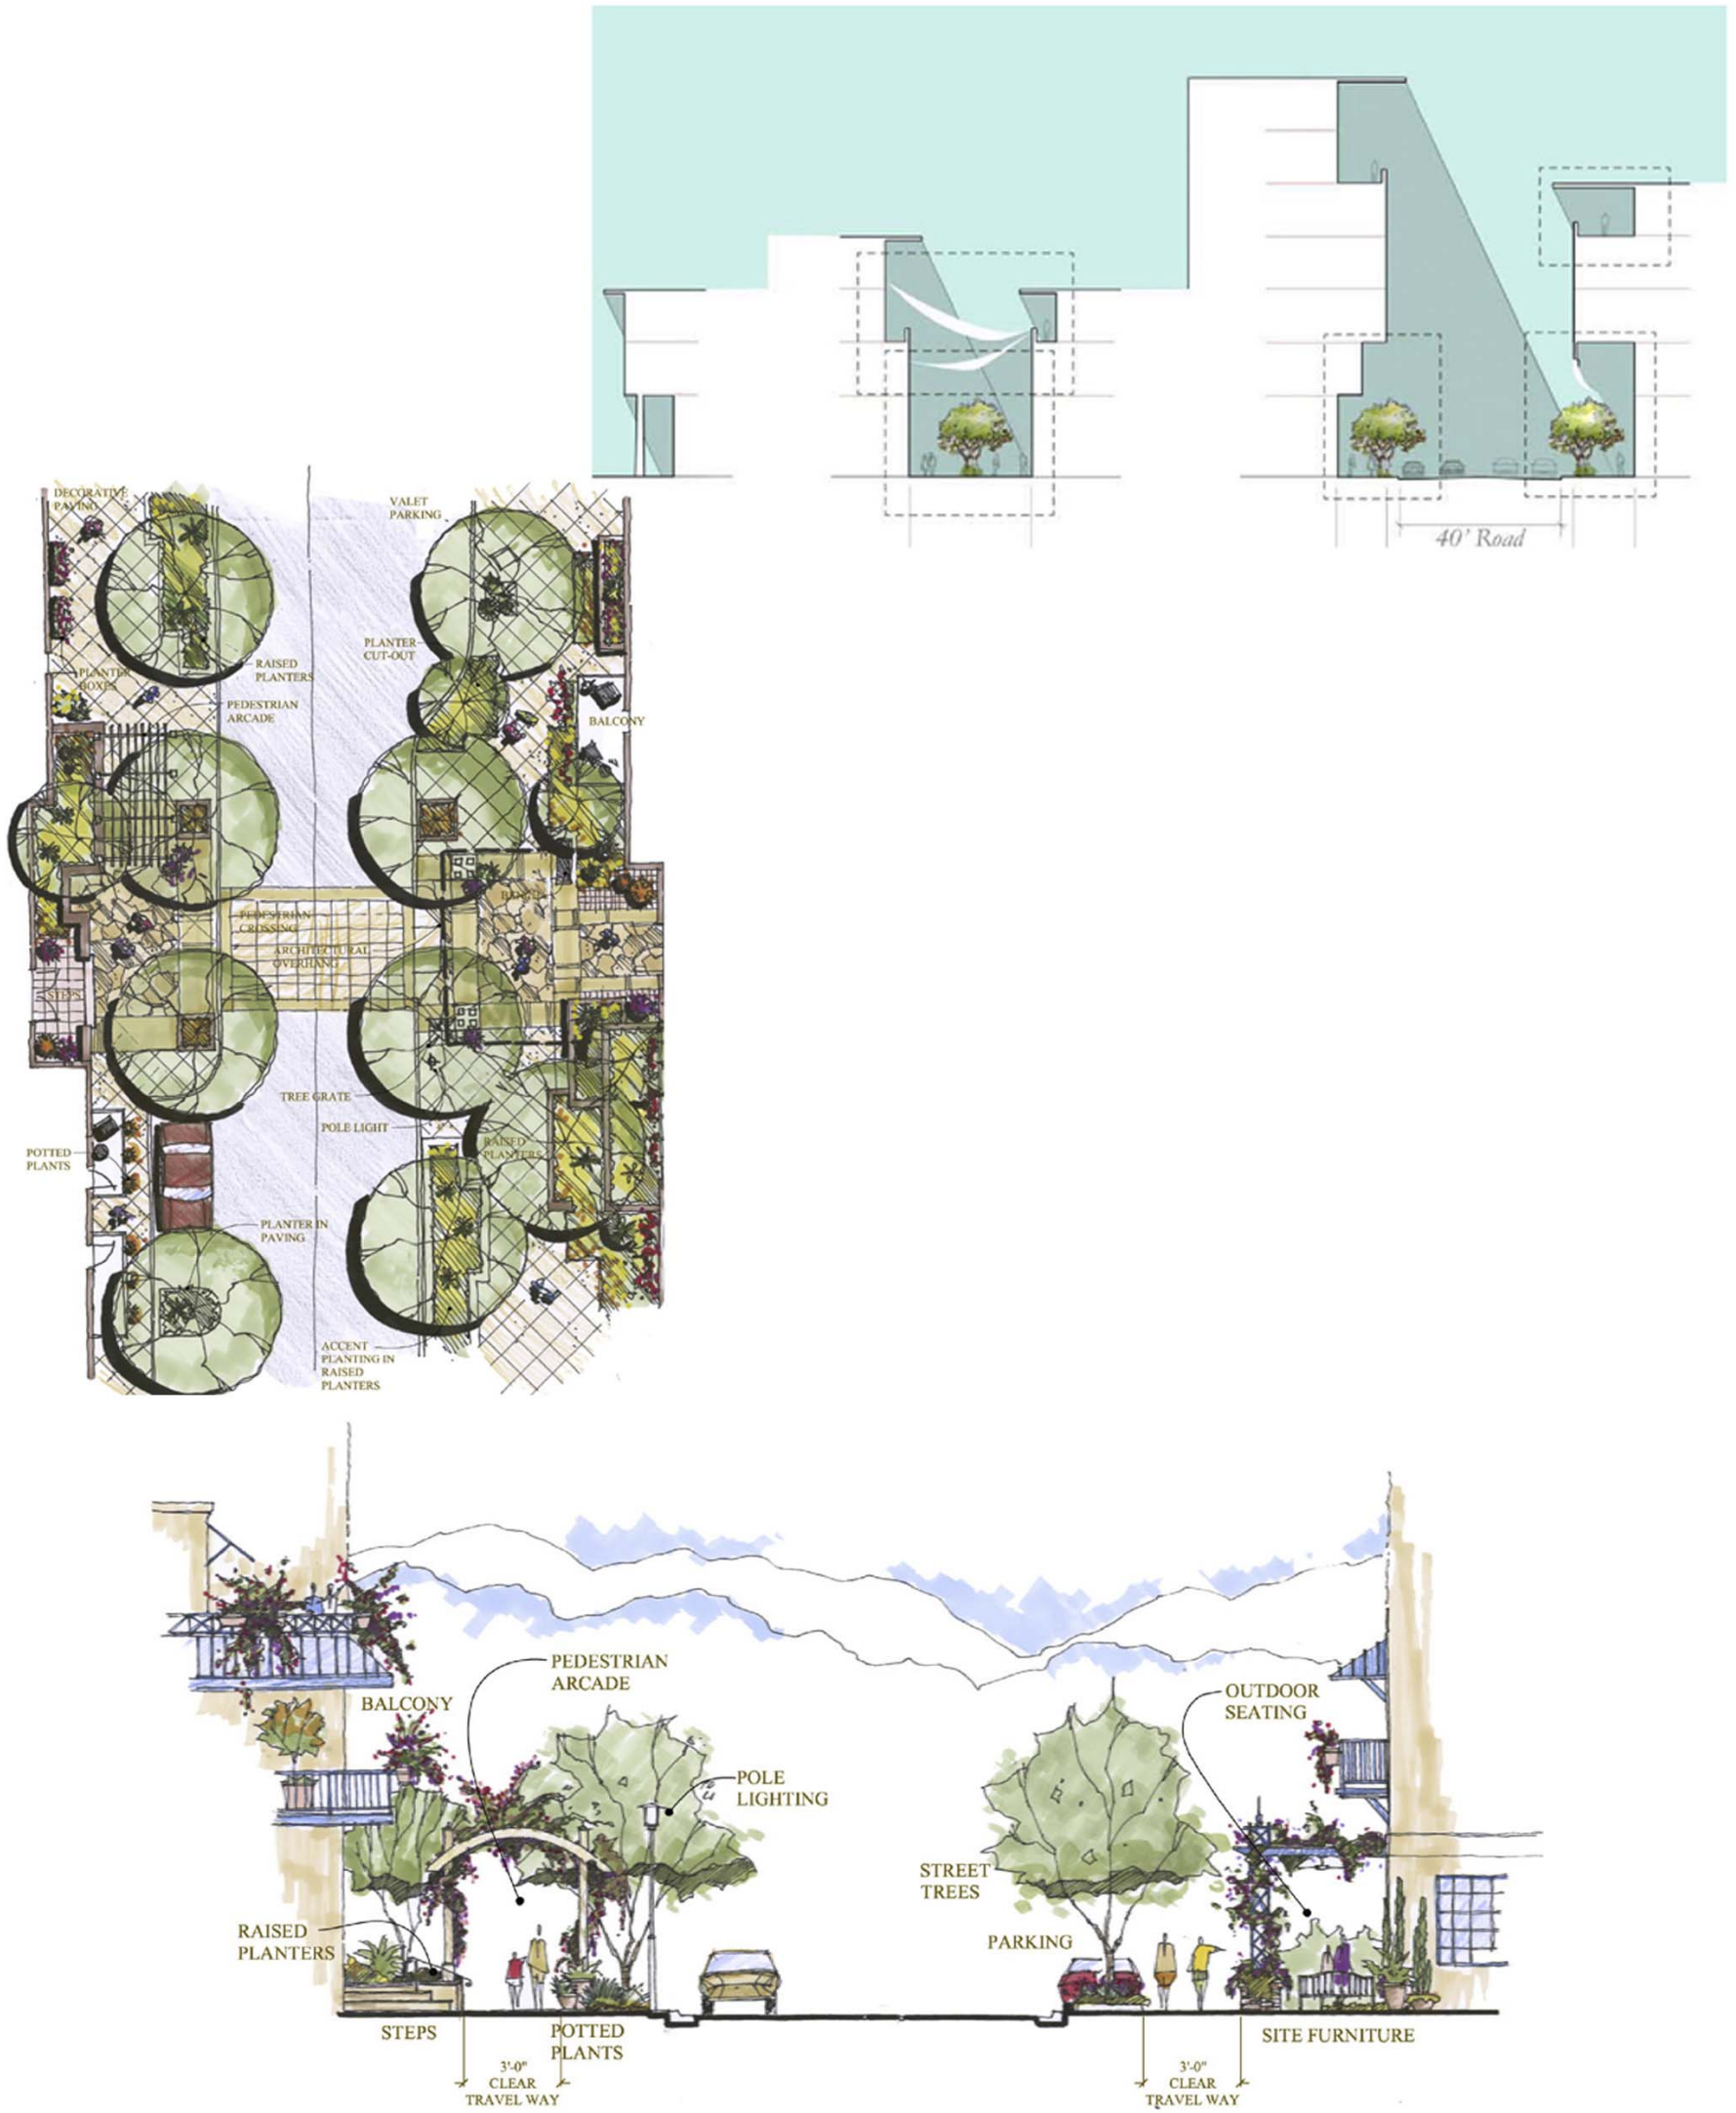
Typical Walkway and Sidewalk Conditions Diagram
